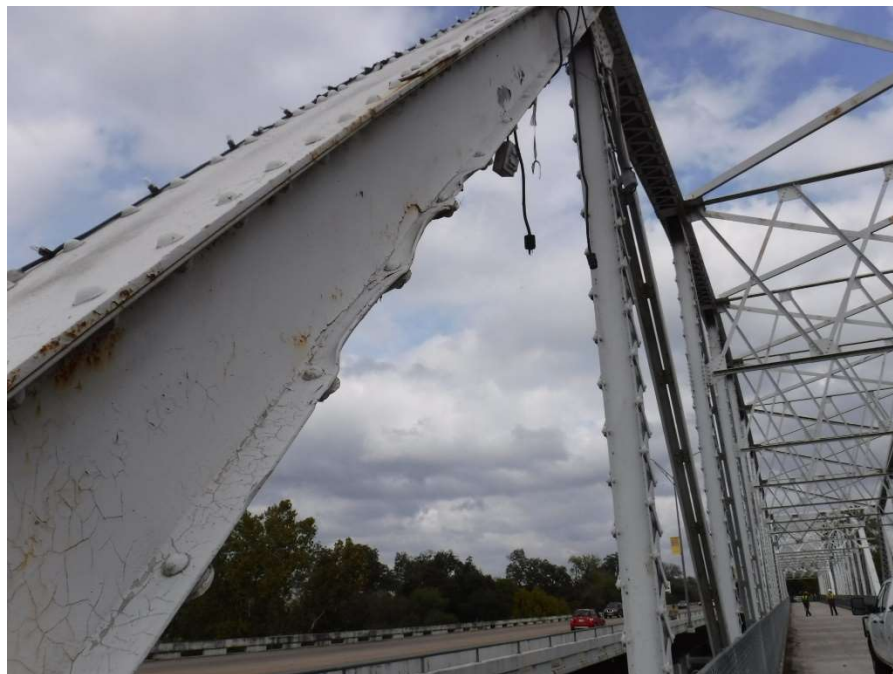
Typical Local Impact Damage on Upper Chord Member L0U1
